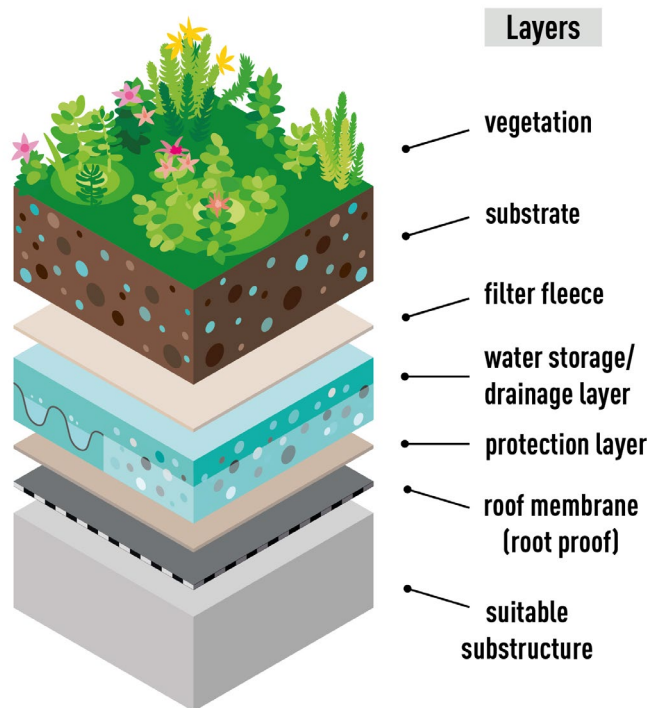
Green roof layers (© GRÜNSTATTGRAU)
